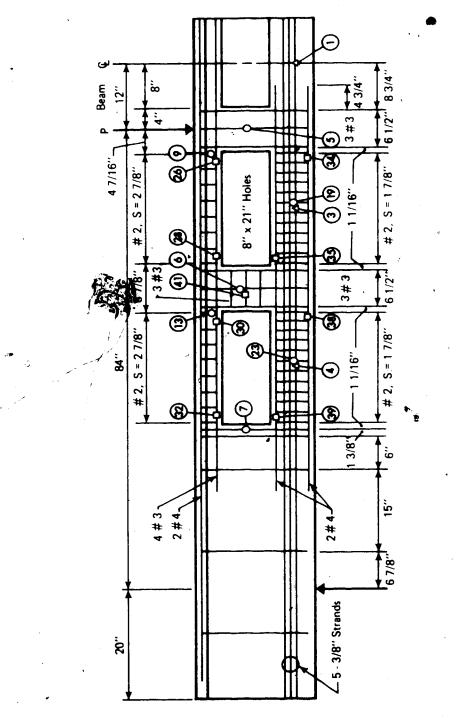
Reinforcement Details and Strain Gage Locations for Beam 30-21-7
